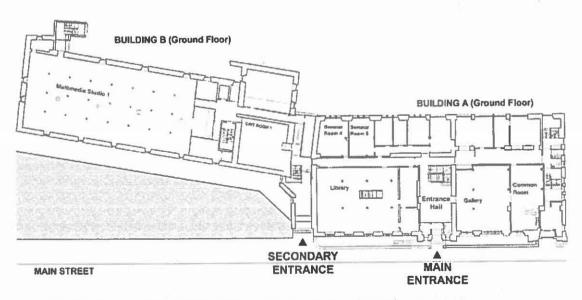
Plan of Building A and Building B ground floor, showing the main and secondary entrances.
